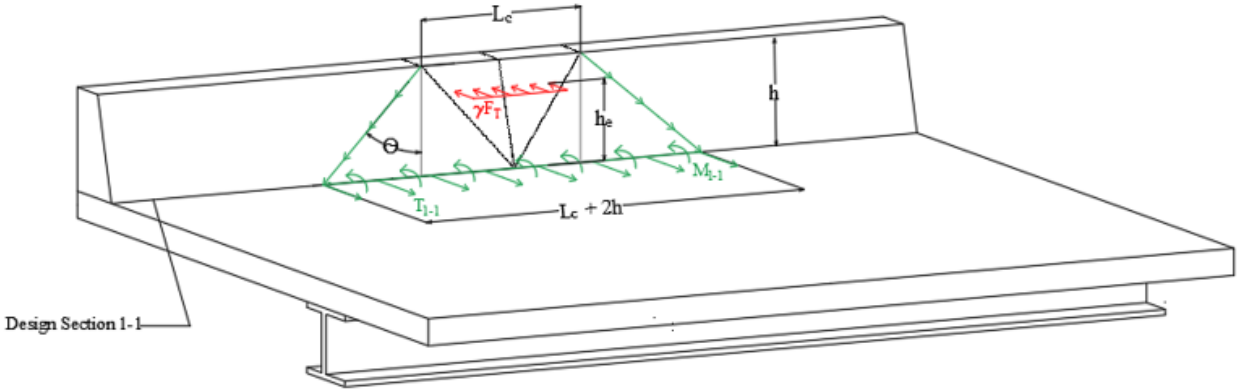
Generic Bridge Rail Deck Loading - Design Case 1, Section 1-1
